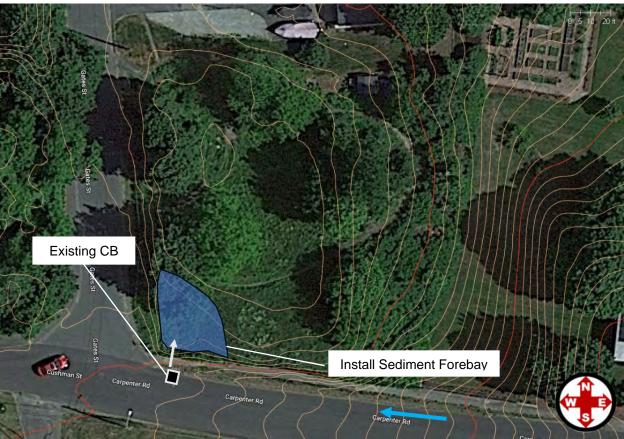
Proposed BMP at intersection of Carpenter Road and Gates Street
